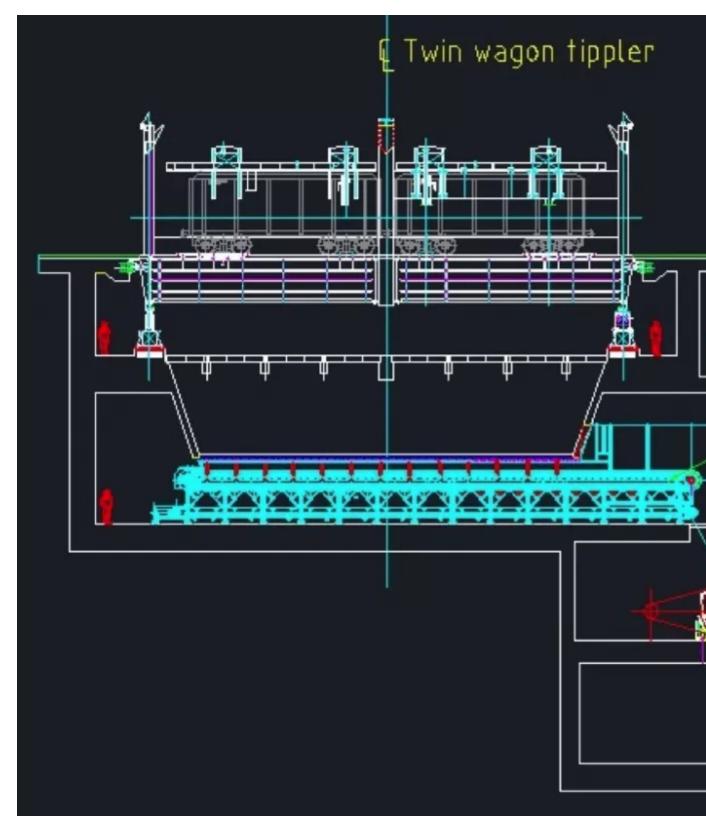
Tandem tippler with apron feeder and primary crusher to crush bigger size lum
